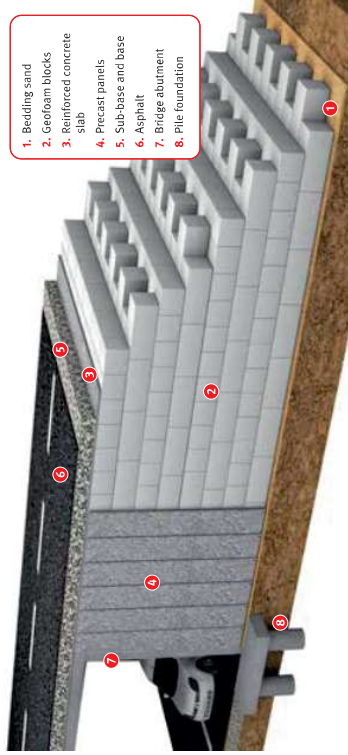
Geofoam block bridge approach embankment with vertical sides
